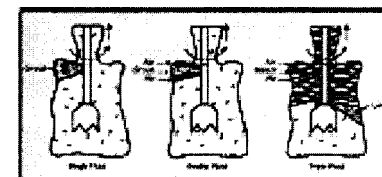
Jet grouting systems (adapted from Walsh, 1992).
